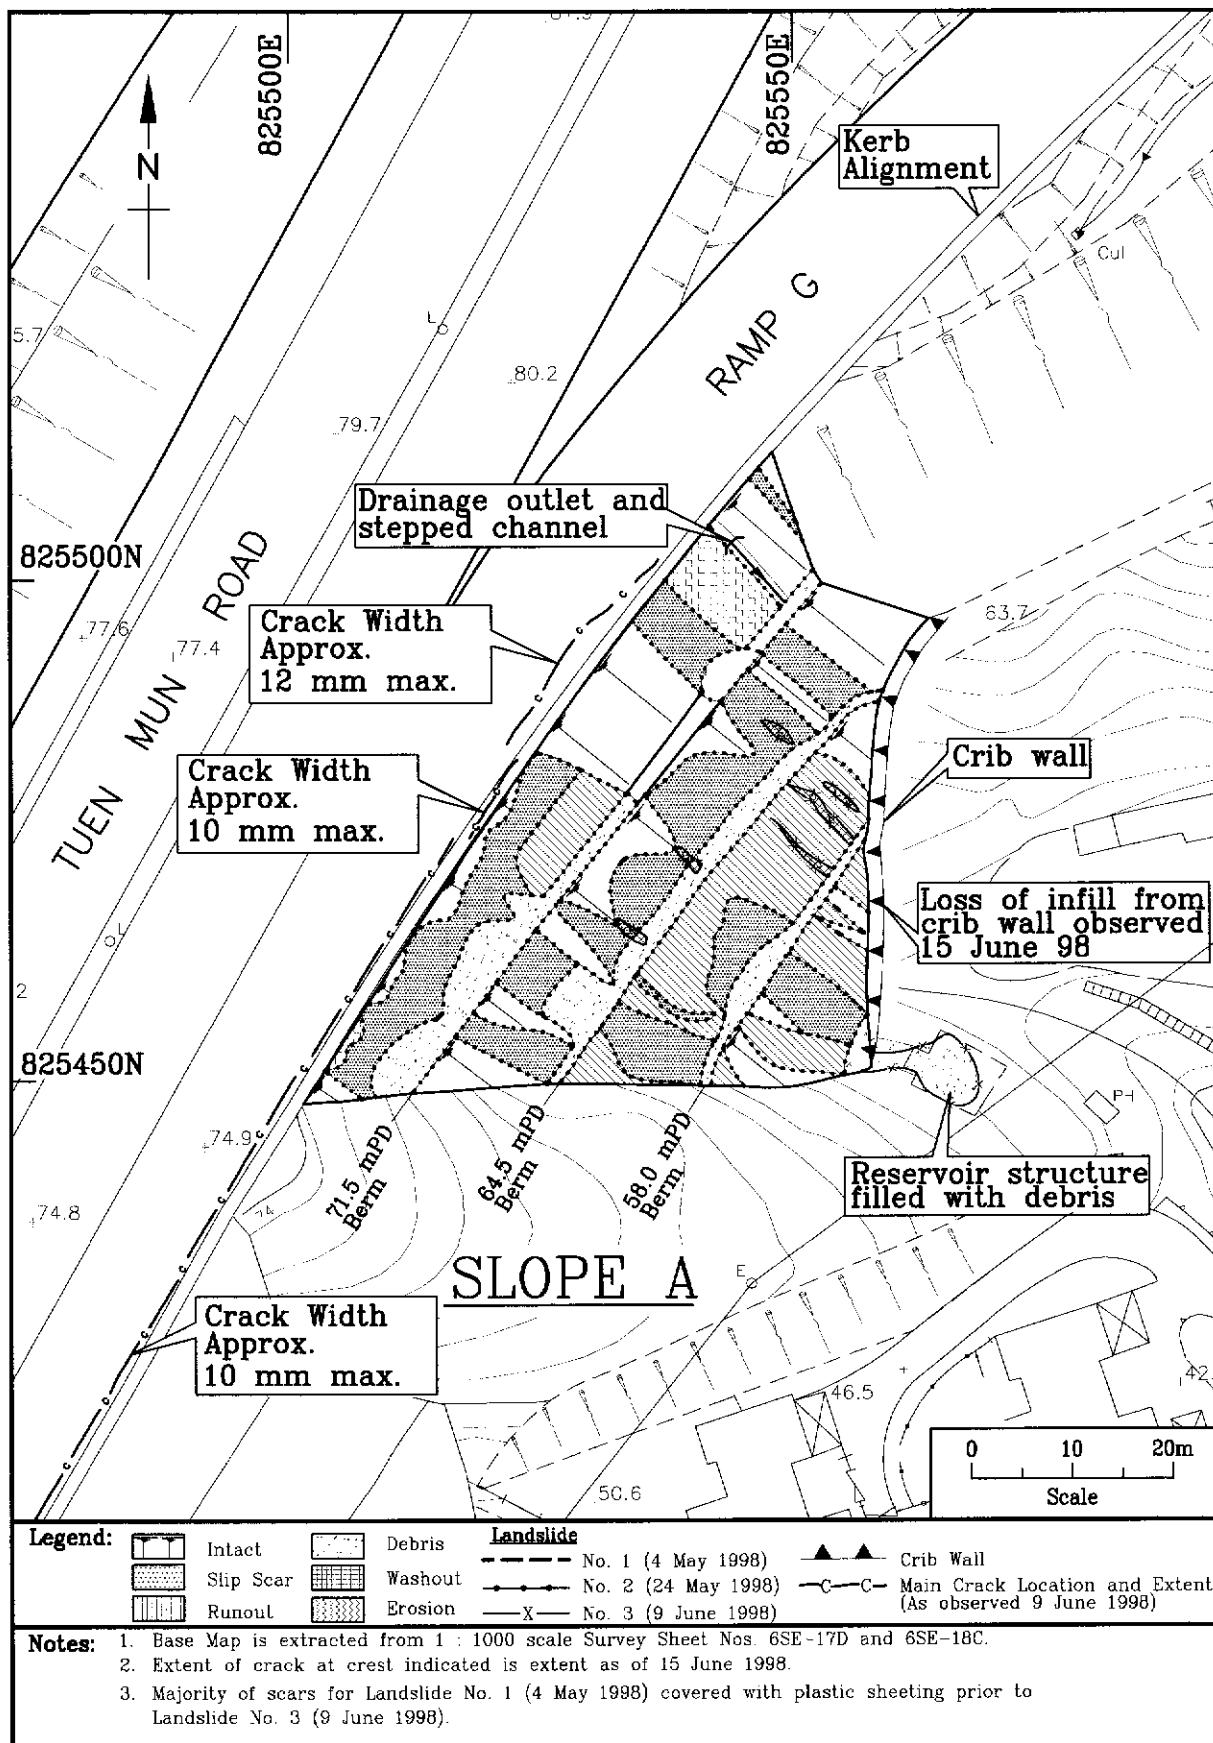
Completed Formation (Slope A) Showing Observations after Failure
